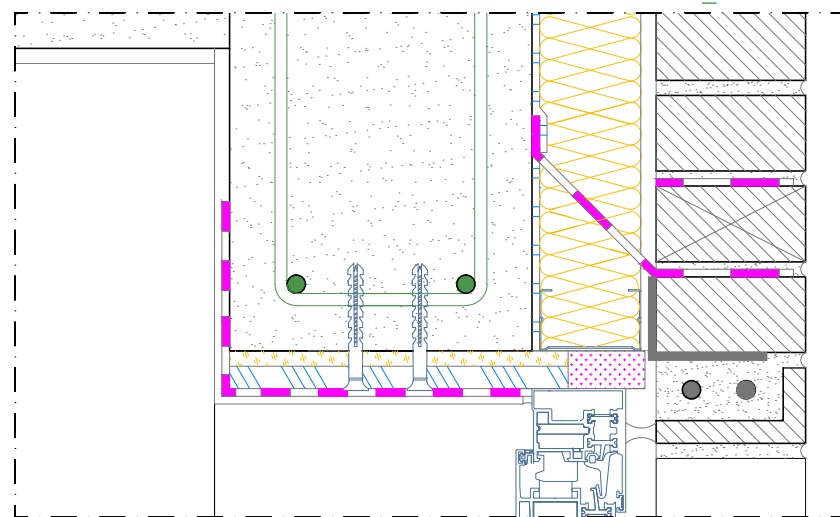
UNION BALCONY-FACADE\_S: 1/5
